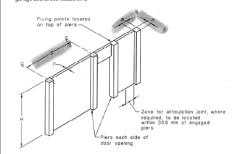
ENGAGED PIERS IN EXTERNAL SINGLE-LEAF WALLS
